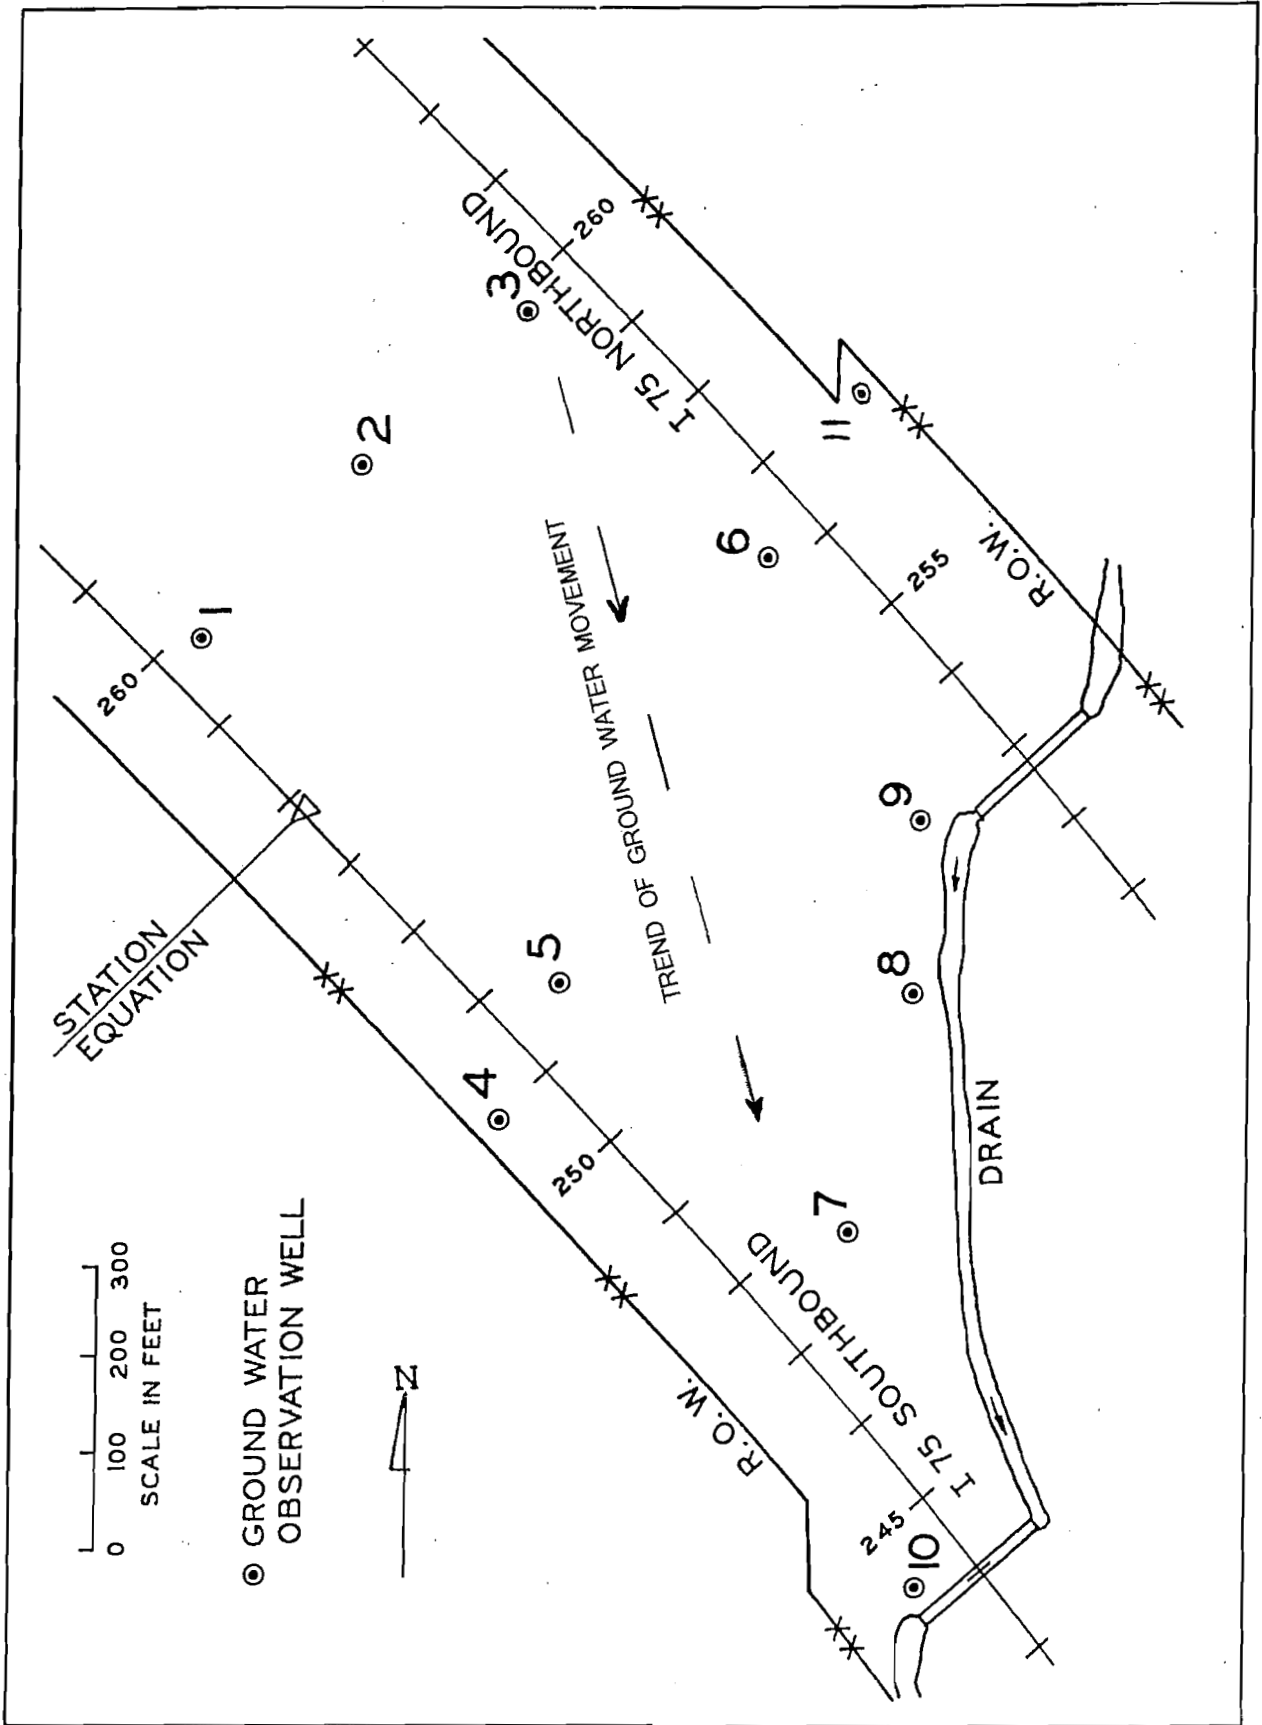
I 75 well locations, south of West Branch. Roadway opened to traffic in 1971.
